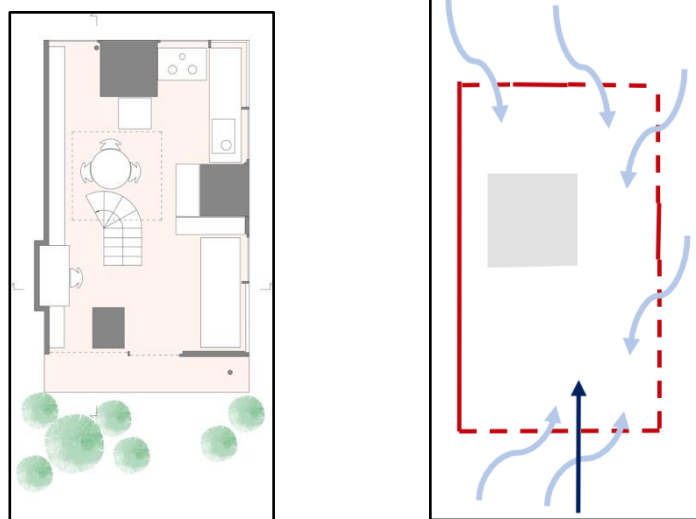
Ground floor plan 1/200, image prepared by the author.
